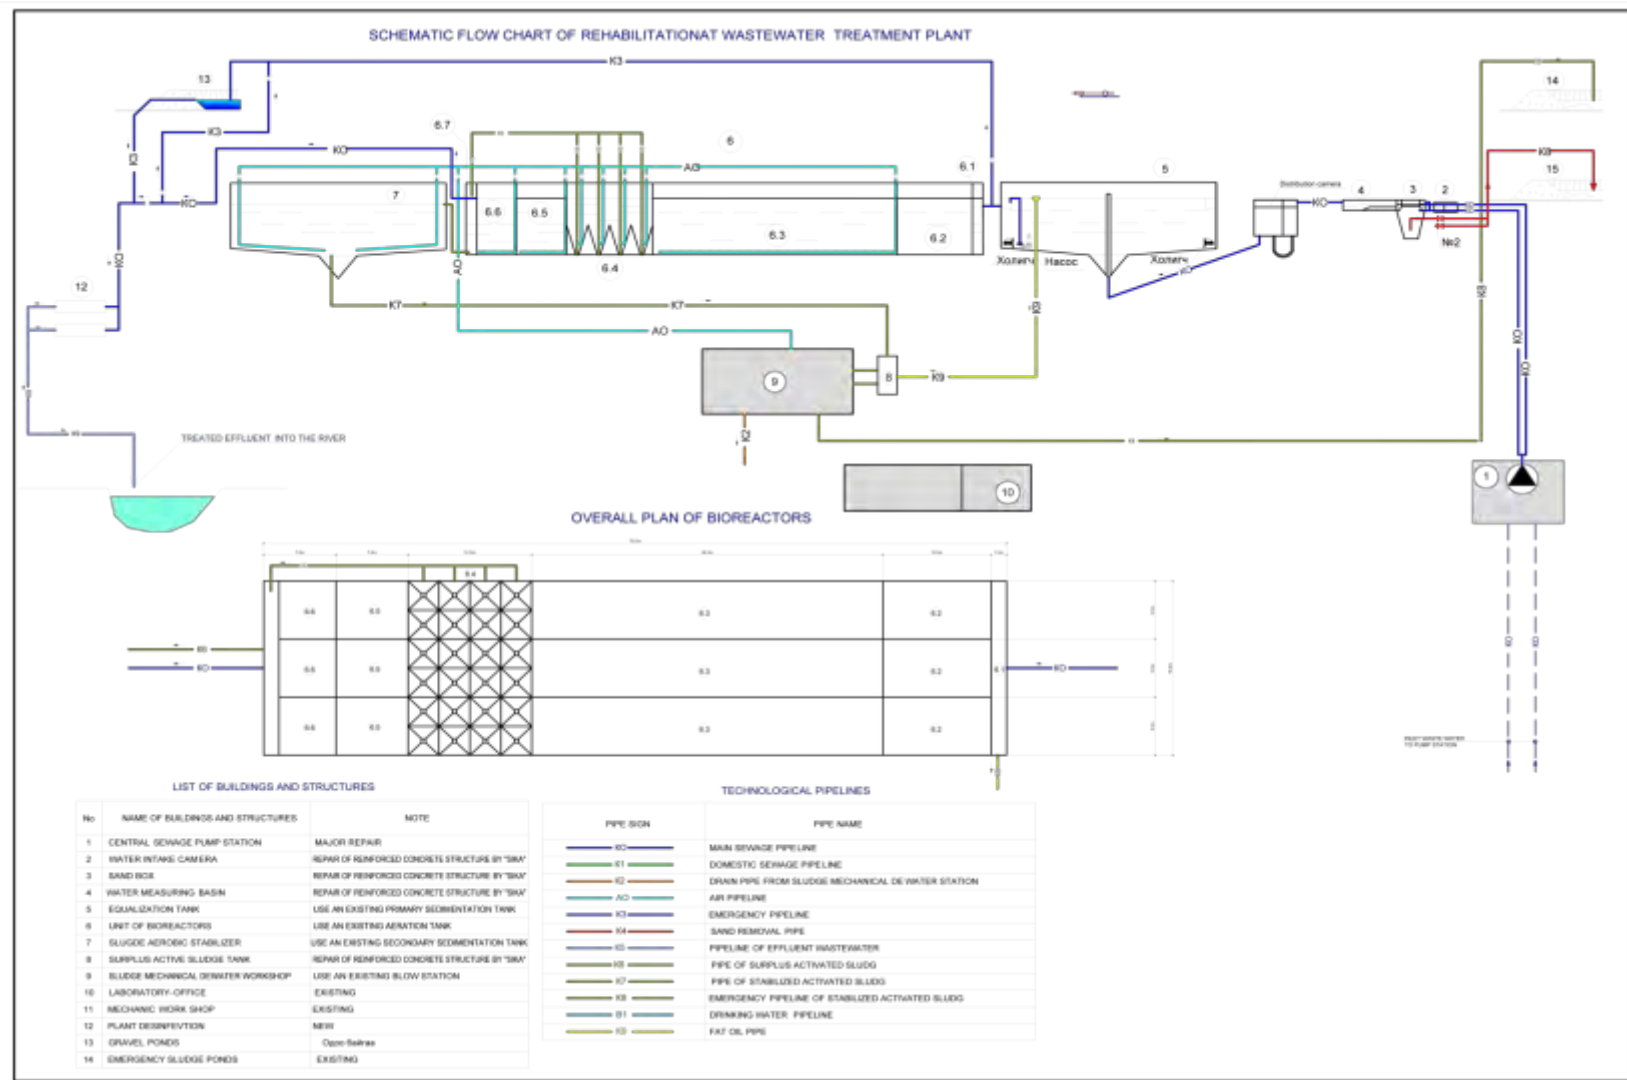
IFAS WWTP Arrangement - Schematic Layout
